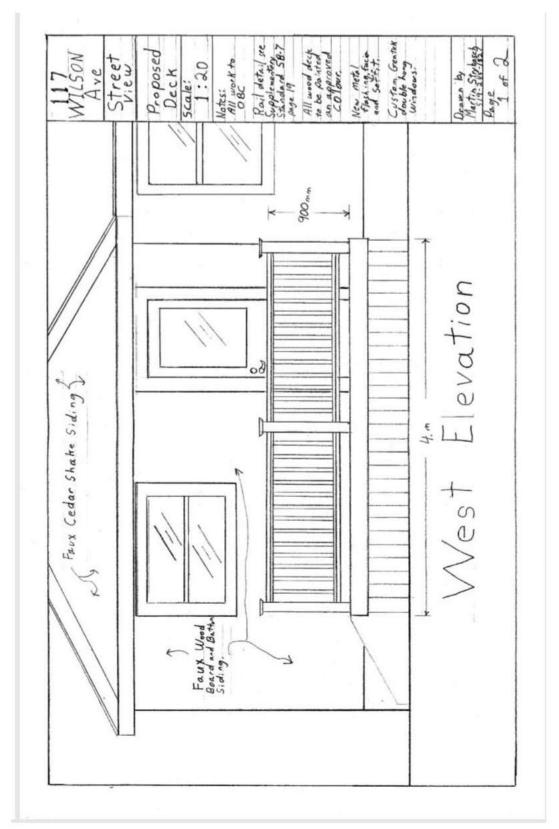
Sketch submitted as part of Heritage Alteration Permit application showing the west elevation of the building with the porch and showing the proposed replacement railing for the porch.
